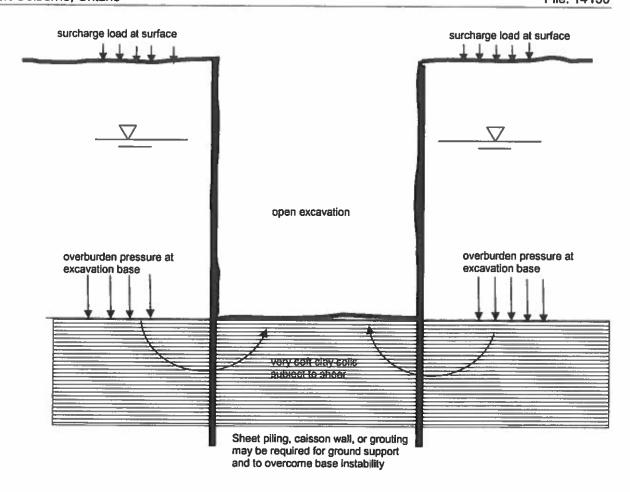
Illustration of Potential Excavation Base Heave Shear Failure
